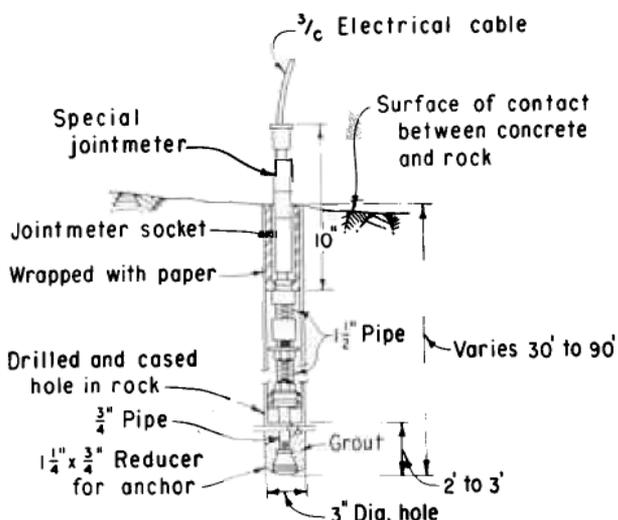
Deformation meter installed in cased well under dam to measure deformation of foundation rock.—288-D-3095
